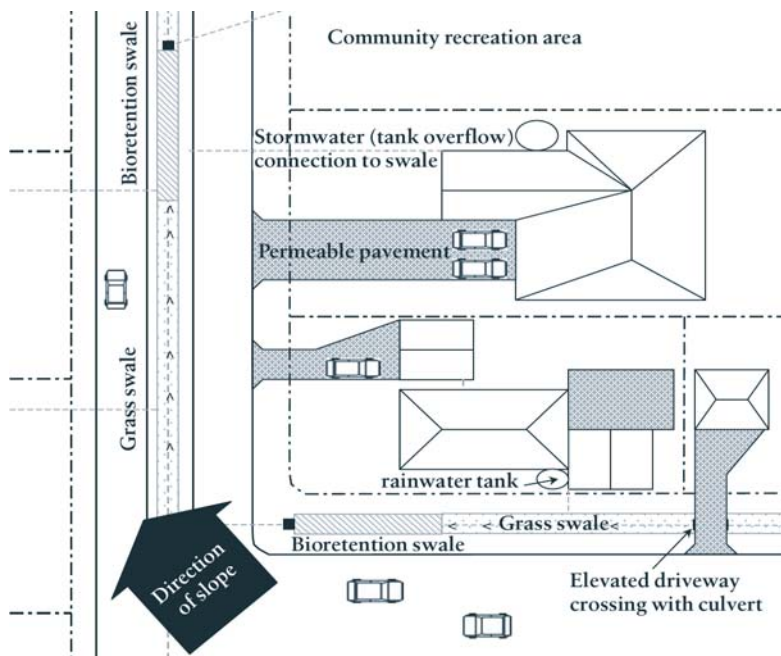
Diagram of Water Sensitive Residential Streetscape Showing Bioretention Swale Street Drainage
